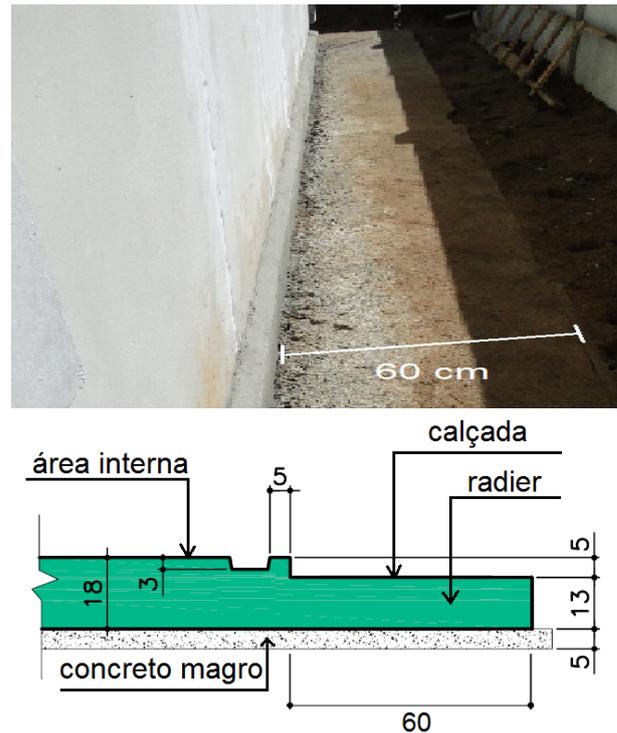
Detail of the sidewalk pointing out the dimensions.
